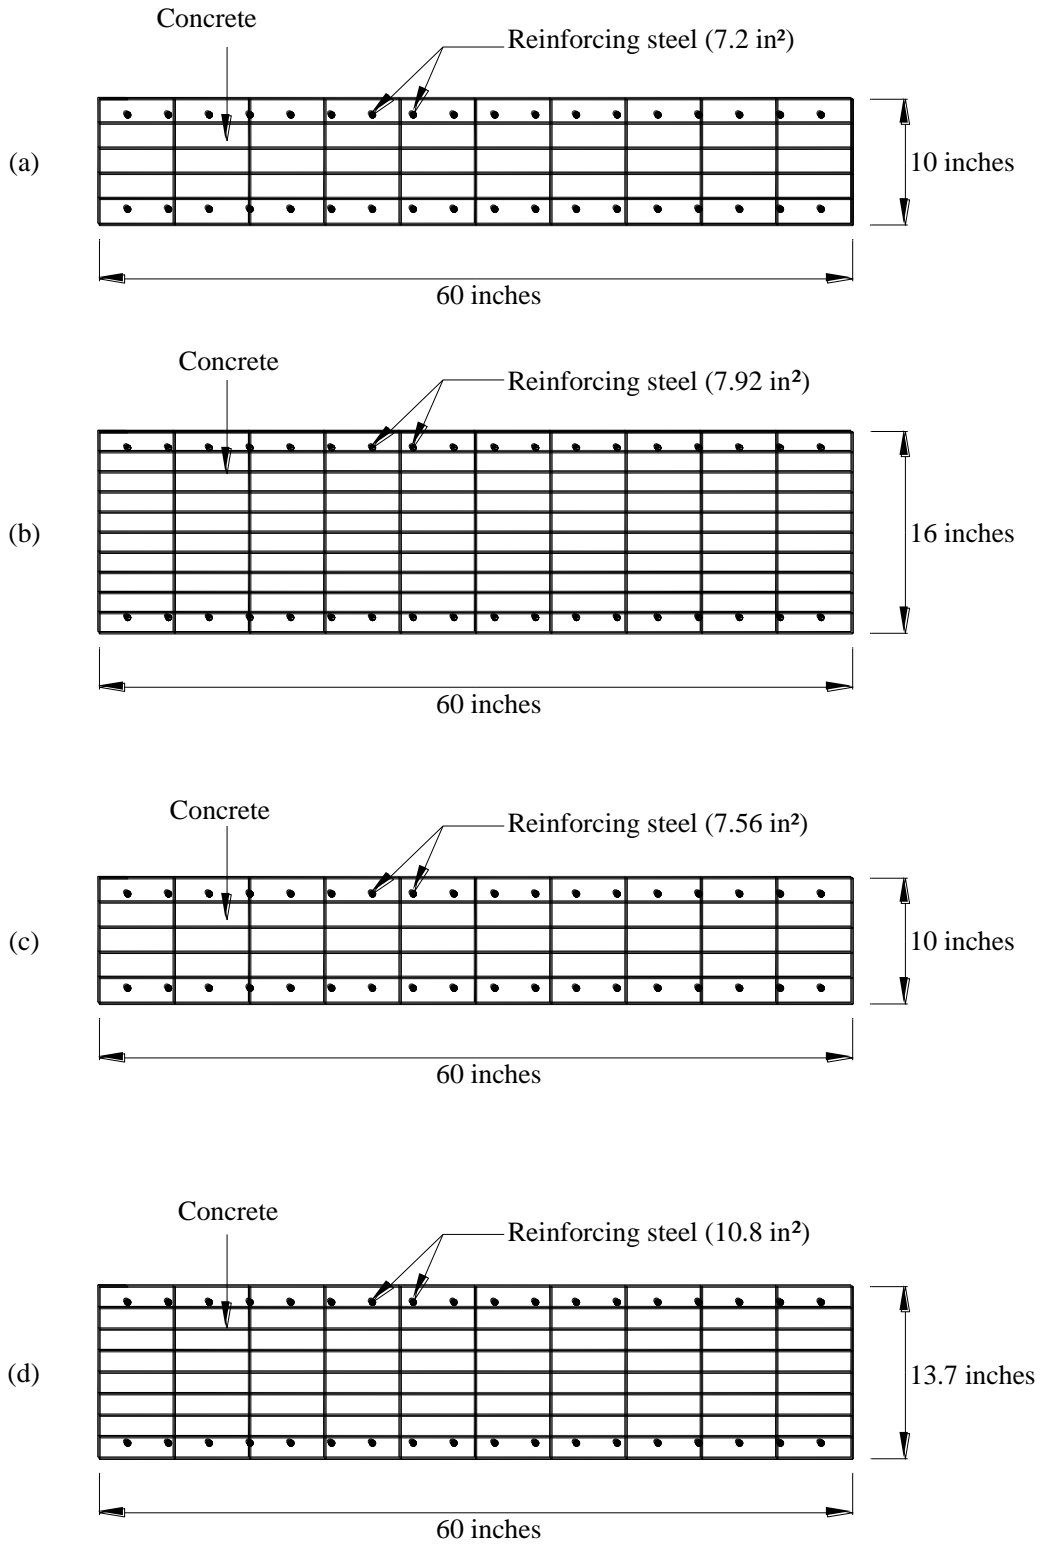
Fiber discretization of cross-sections in (a) walls; (b) slab; (c) middle of roof; (d) roof close to the wall
